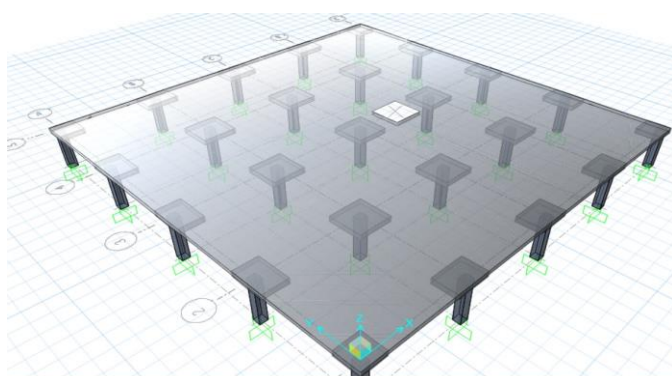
flat slab with a drop with opening at 1.0m from column face in an isometric view
